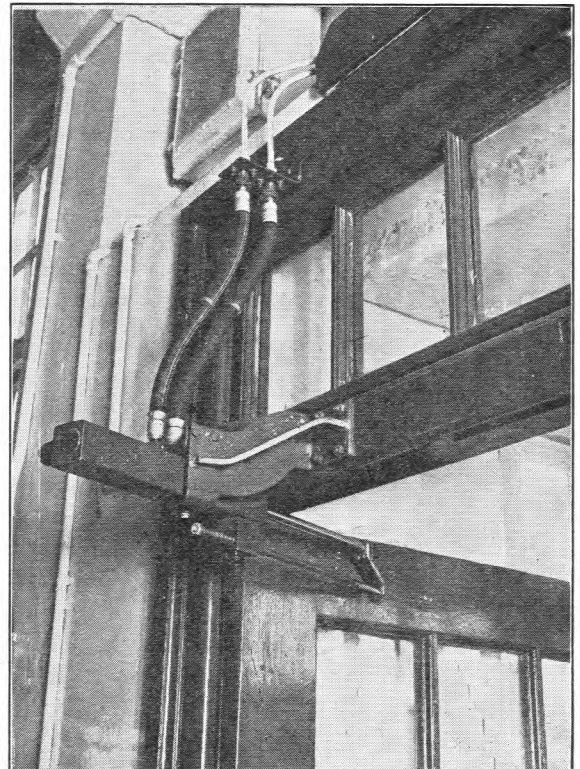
HYDRAULIC JACK FOR OPENING SWING DOOR.
